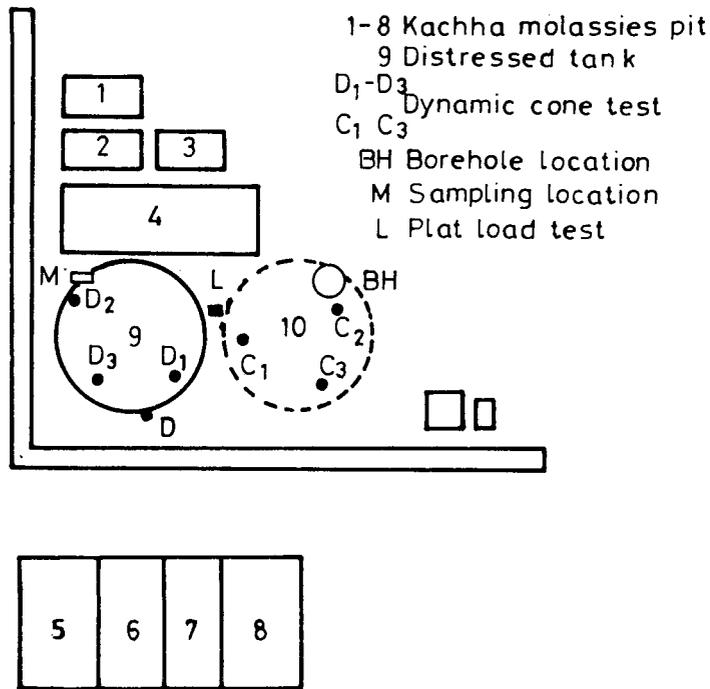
Site Plan Showing Location of Distressed Tank & Test Points
